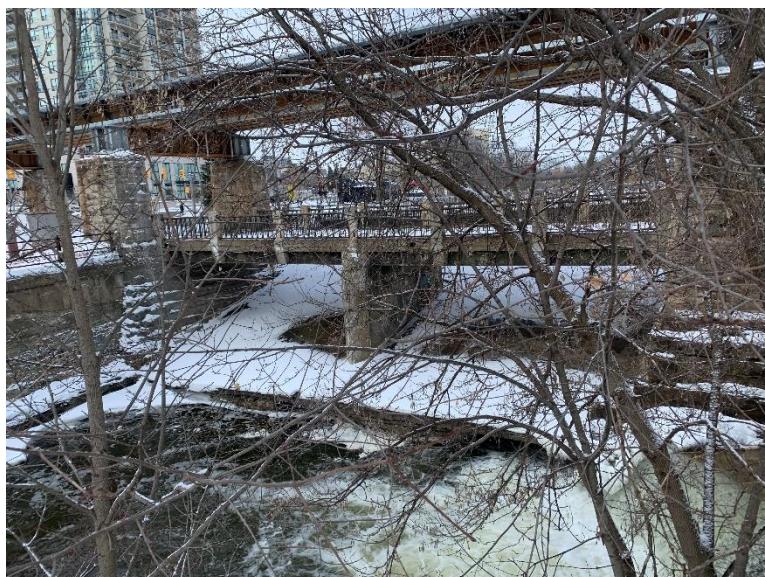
Allan's Spillway, looking southwest (ASI 2022)
